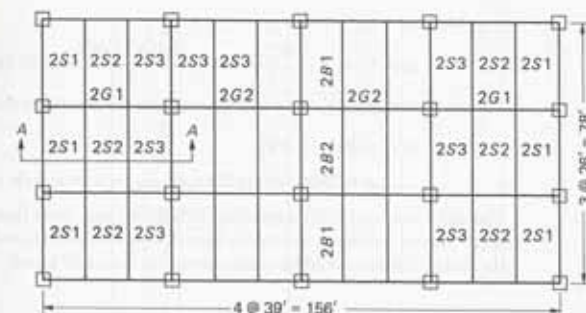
Second-floor framing plan (for Section A-A, see Fig. 8.4.2).
